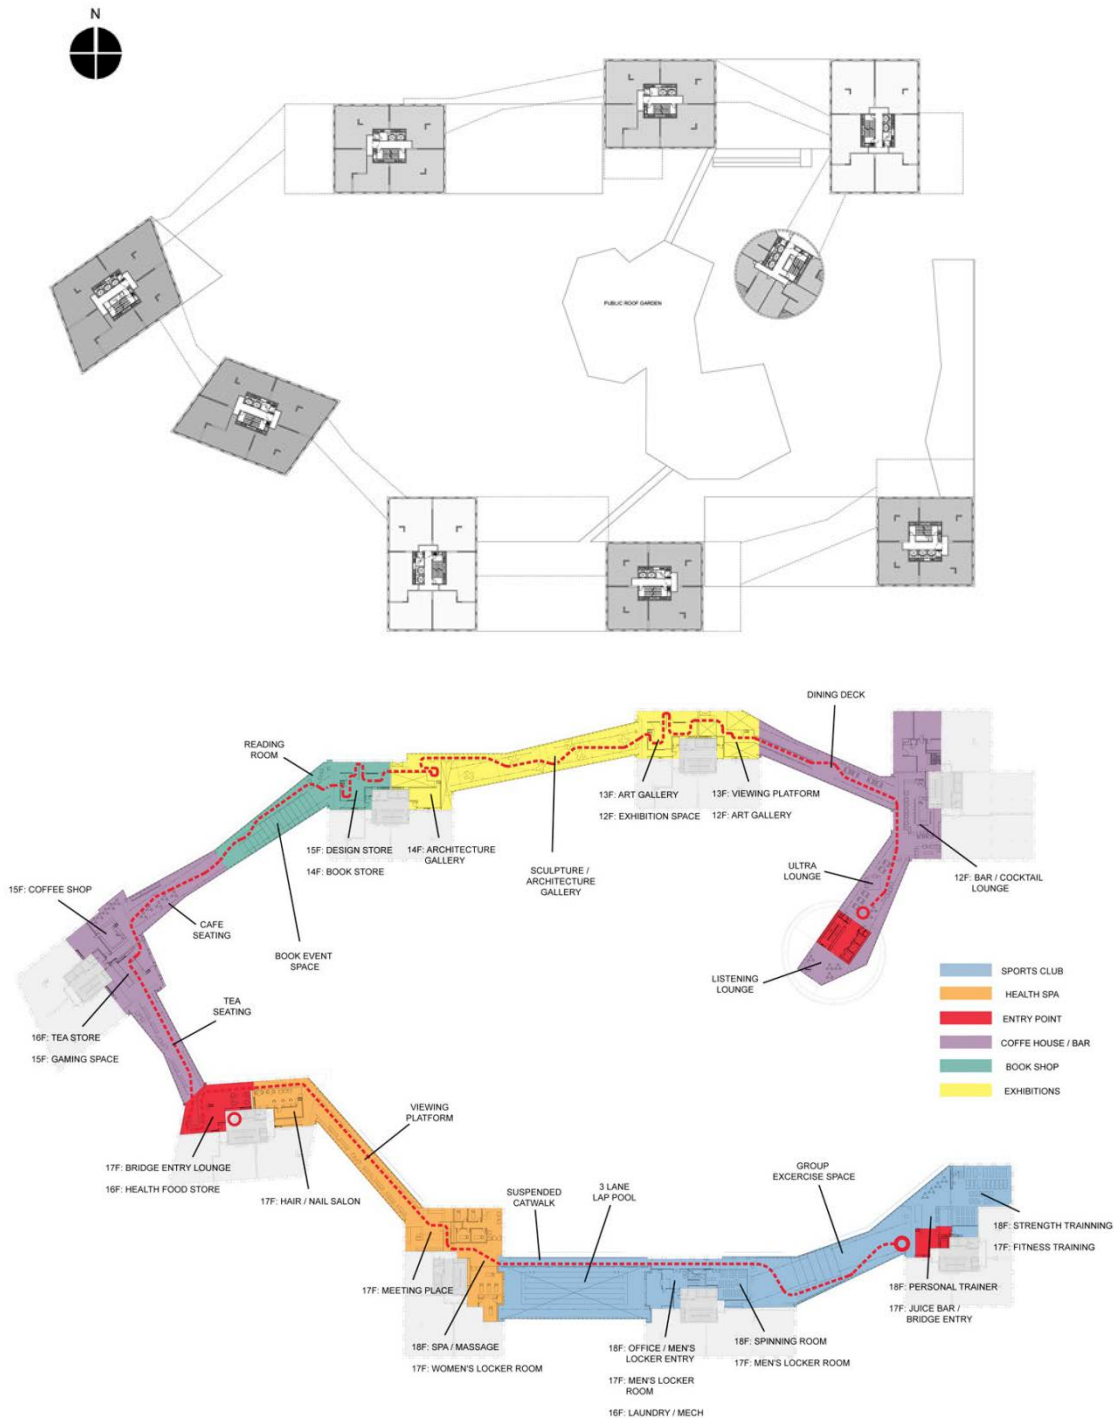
Floor plan of Linked Hybrid Complex. (Source: <http://www.archdaily.com/34302/linked-hybrid-steven-holl-architects>)
